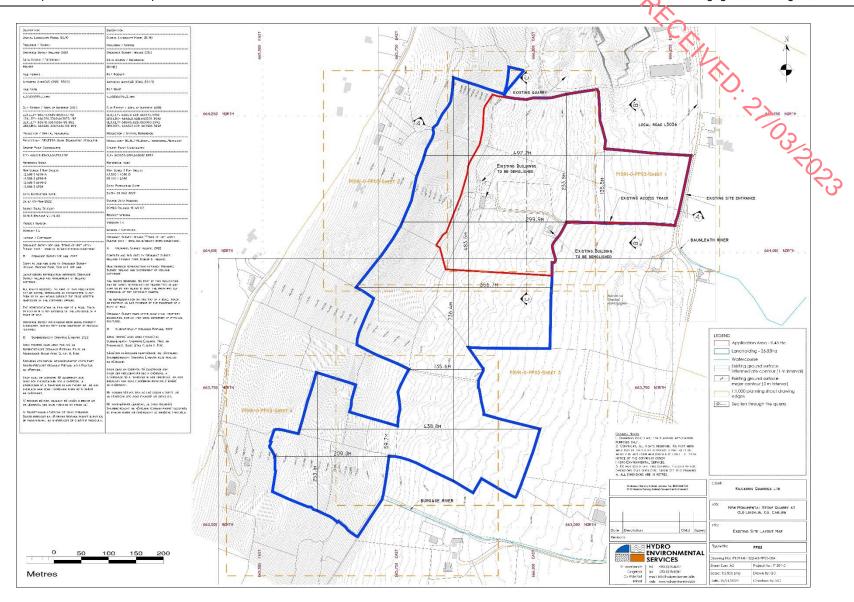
Existing topography of the site of the Proposed Development. Proposed Development site outlined in red
